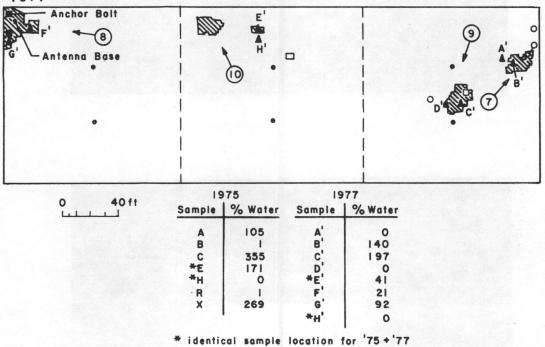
Plan views of the 1975 and 1977 survey results for Building 120.
